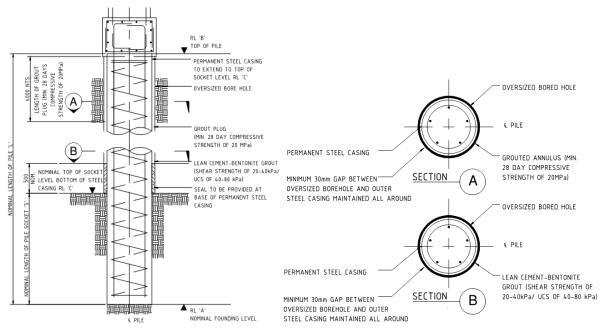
Section and details of the pile design developed for the MLCP (a) Section showing the pile design concept (b) Details of the pile design concept.
